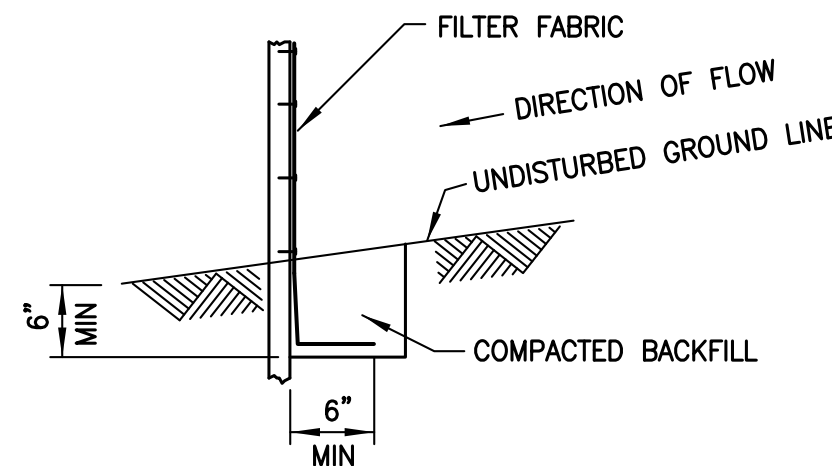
C2 DETENTION BASIN OUTLET PIPE REPLACEMENT
